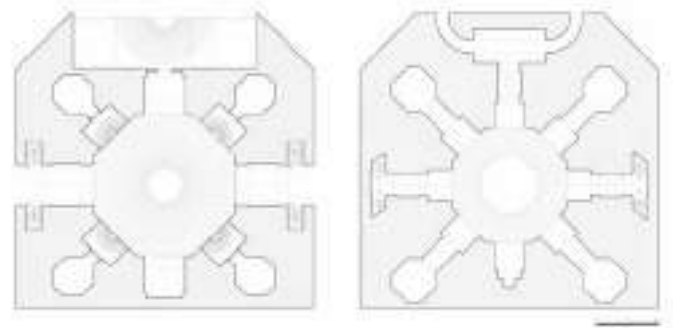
(i) Ground floor plan (ii) Basement floor plan
